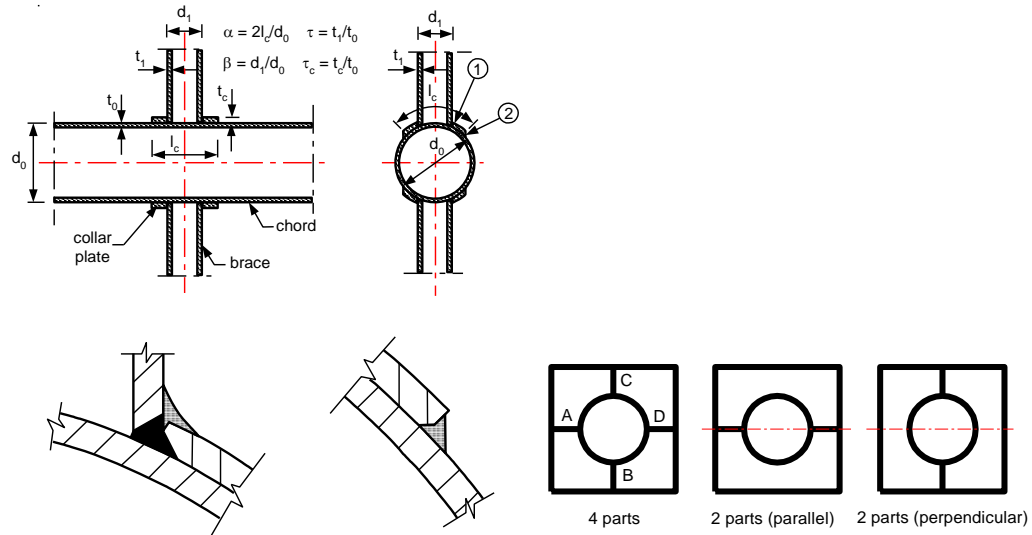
Collar plate stiffened joints with possible weld arrangement
